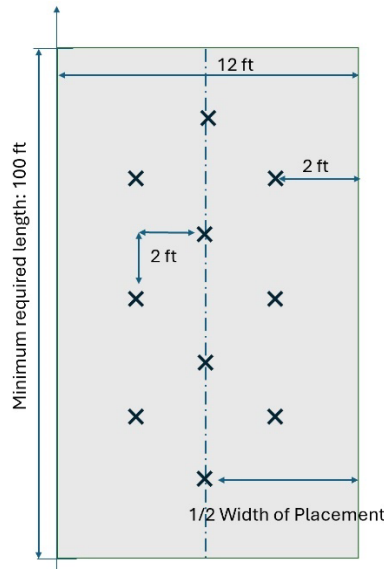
Test Strip Site Preparation (perform a minimum of 10 tests)
